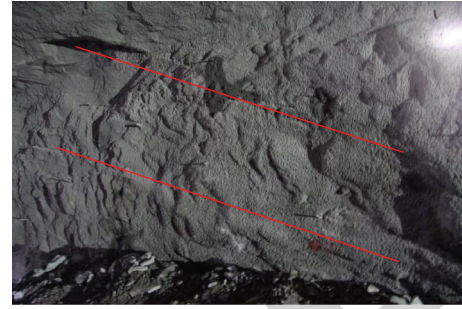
Wedge failure of side wall and arch shoulder in K0 + 10 m of the main transformer room downstream.
